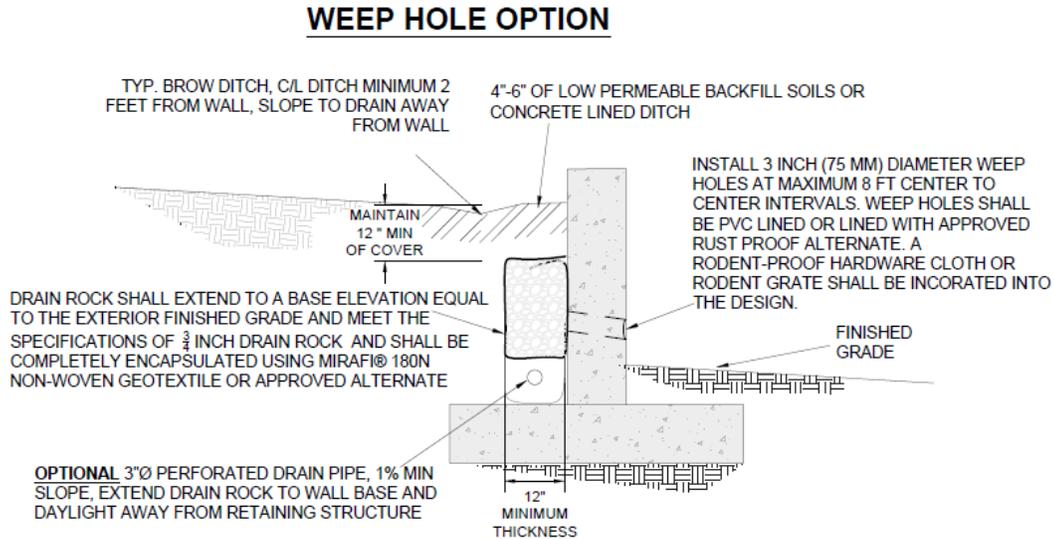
Option 2 Typical Non-Basement Retaining Wall Back-of-Wall Drainage Schematic
